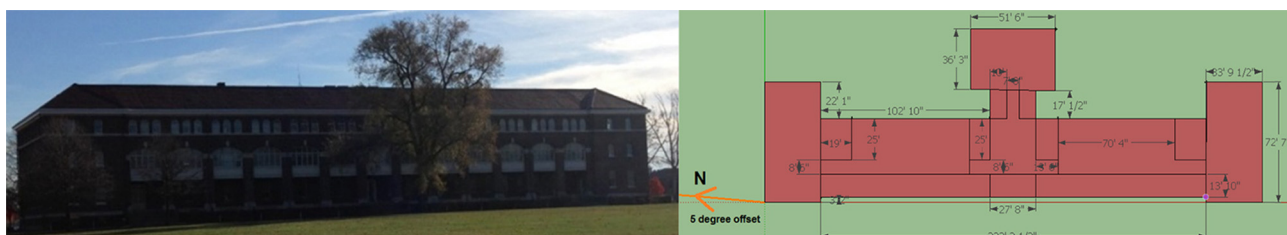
Office building at the Philadelphia Navy Yard: (a) front side of building and (b) floor plan in the energy model.
